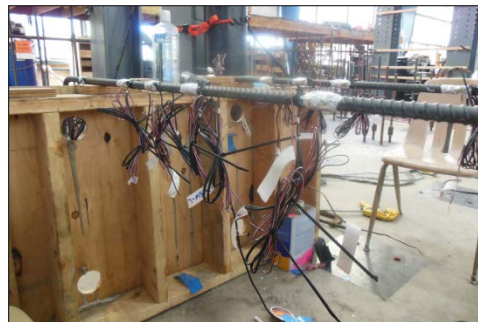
Photograph of strain gages on longitudinal column rebar
